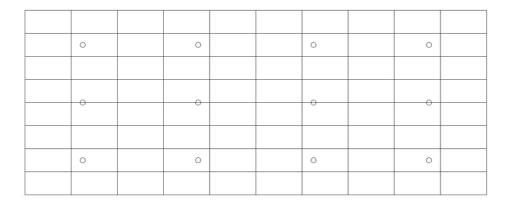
shows the original steel system lighting layout. A total of 12 luminaires are provided at a maximum spacing of 10 feet.
